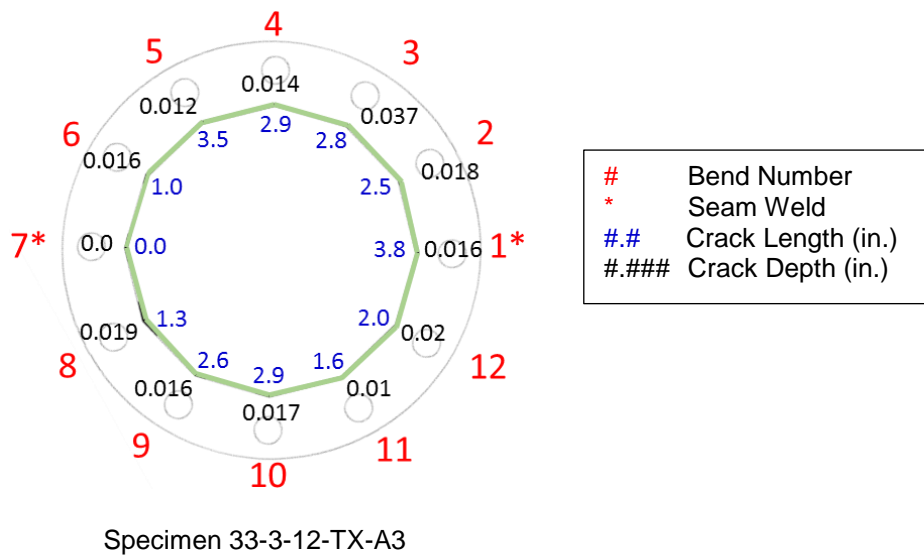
Specimen 33-3-12-TX-A3: Initial Cracks at the Beginning of Test 3
